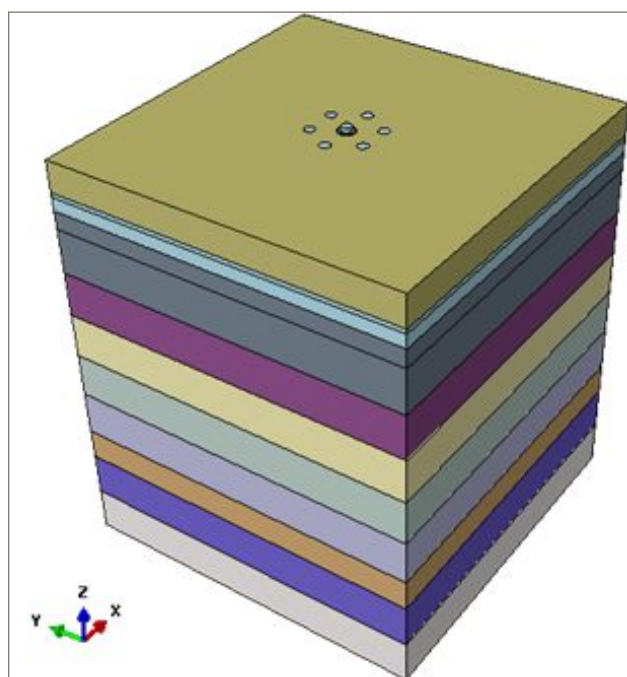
3D Model of the Test Pile, Anchor Pile Surrounding Test Pile and the Soil Media around the Piles
